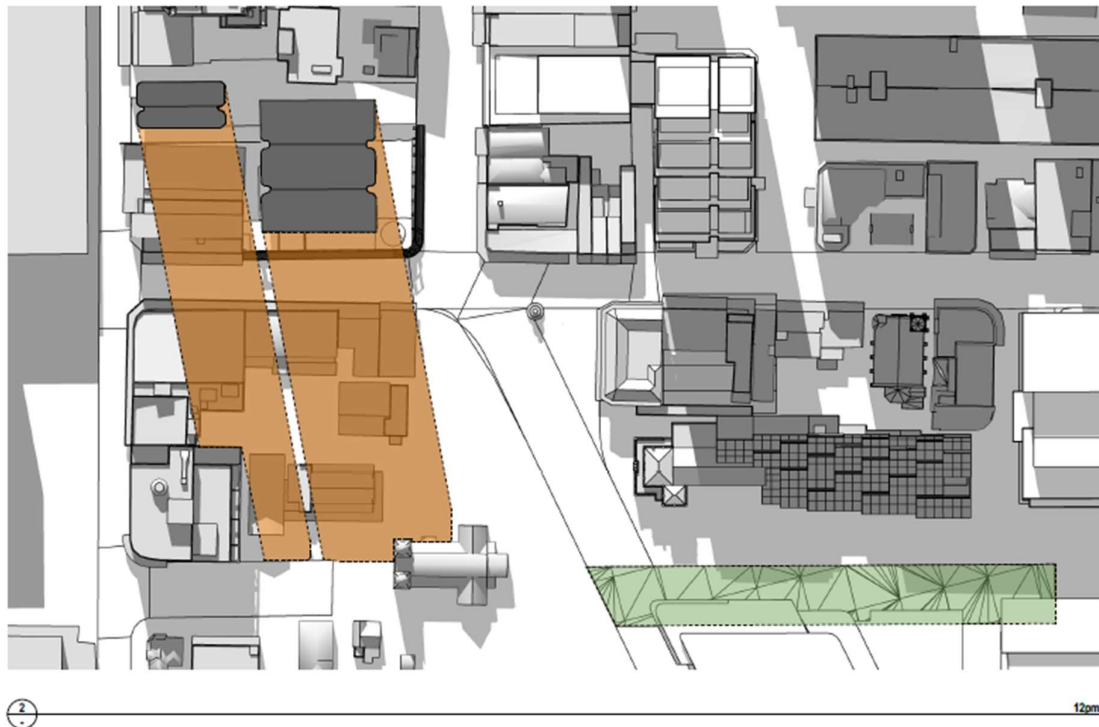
overshadowing caused by the proposal at 12pm on 21 June. (Grey shading indicates overshadowing from existing buildings. Orange shading indicates overshadowing from subject proposal at approximately 104 metres height. Source: Applicant's Indicative Reference Design).
